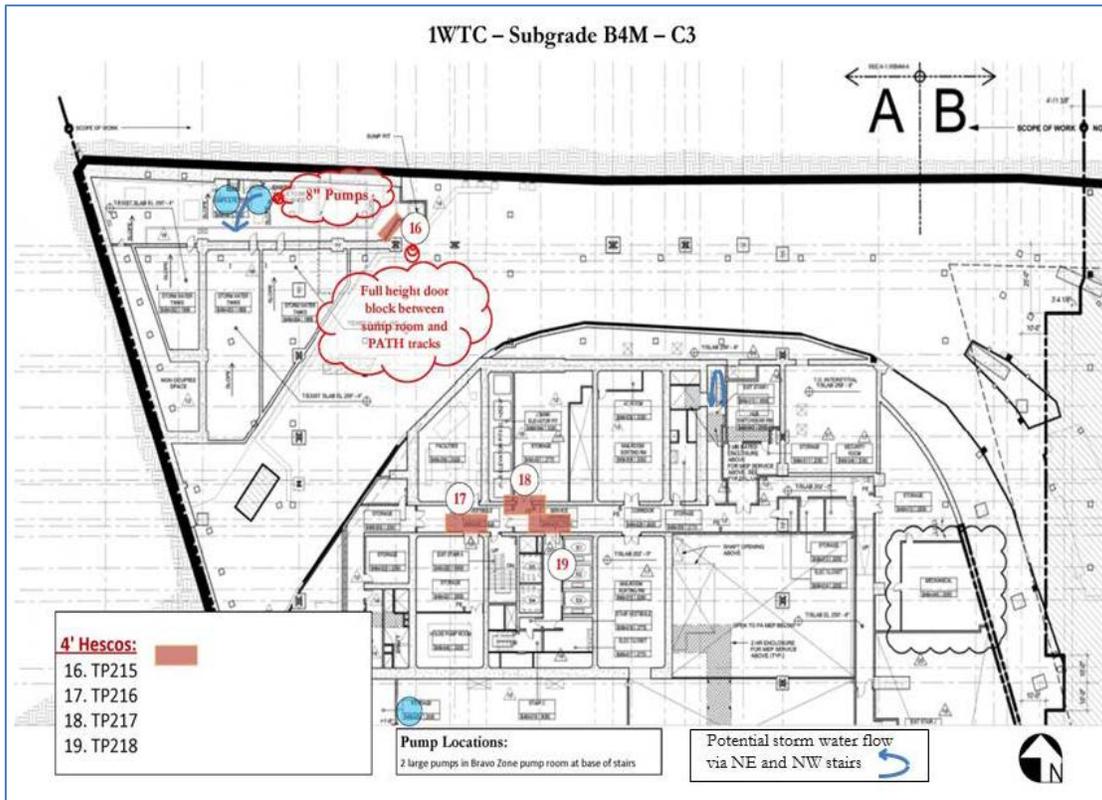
Subgrade Barrier Plan for 1WTC, Floor C3
